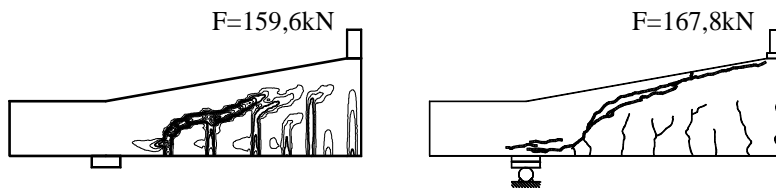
Crack propagation at failure of test beam 4K2 from Non-FEM and test
